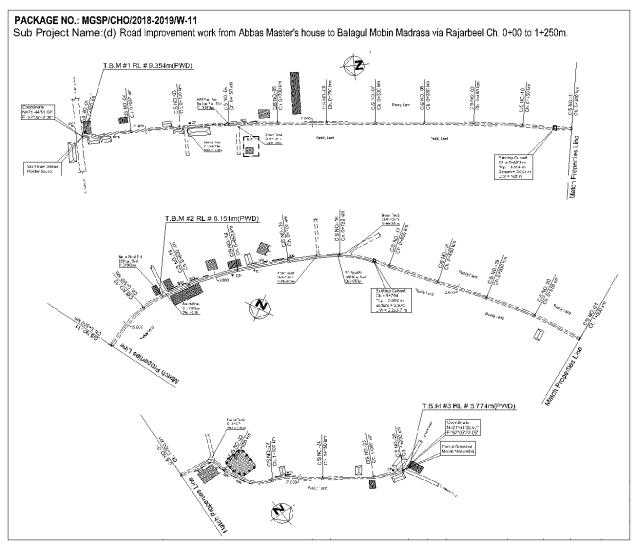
(d): Layout Plan of the proposed Subproject Road from Abbas Master's house to Balagul Mobin Madrasa via Rajarbeel
